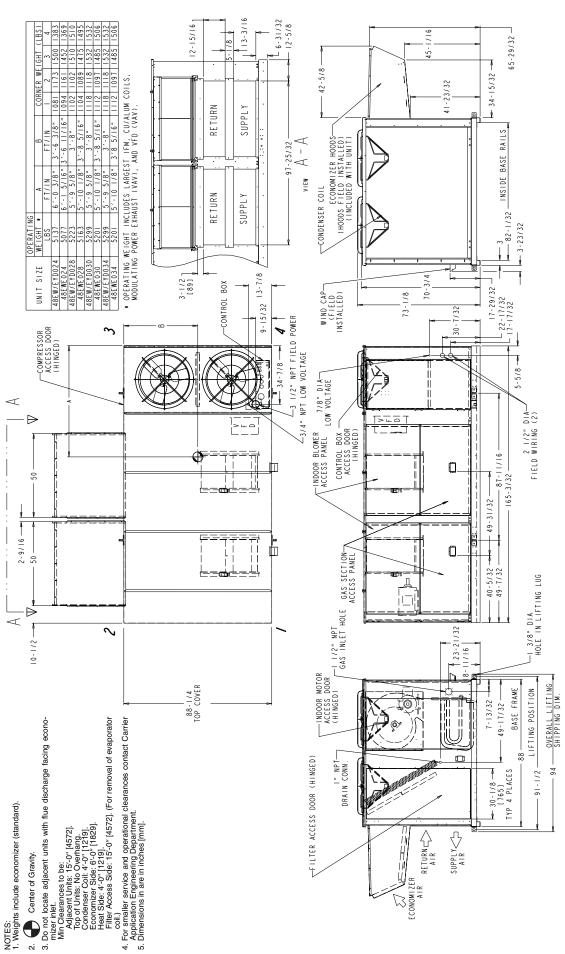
Base Unit Dimensions — 48EW, EY 024-034
